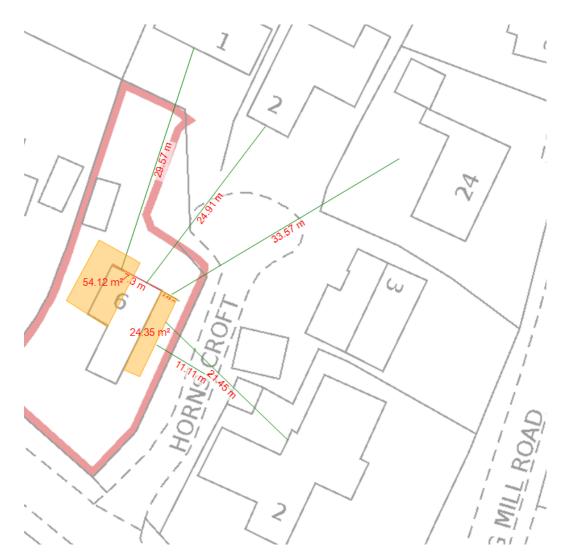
Extract from submitted Location Plan showing plotted dimensions to neighbouring properties
